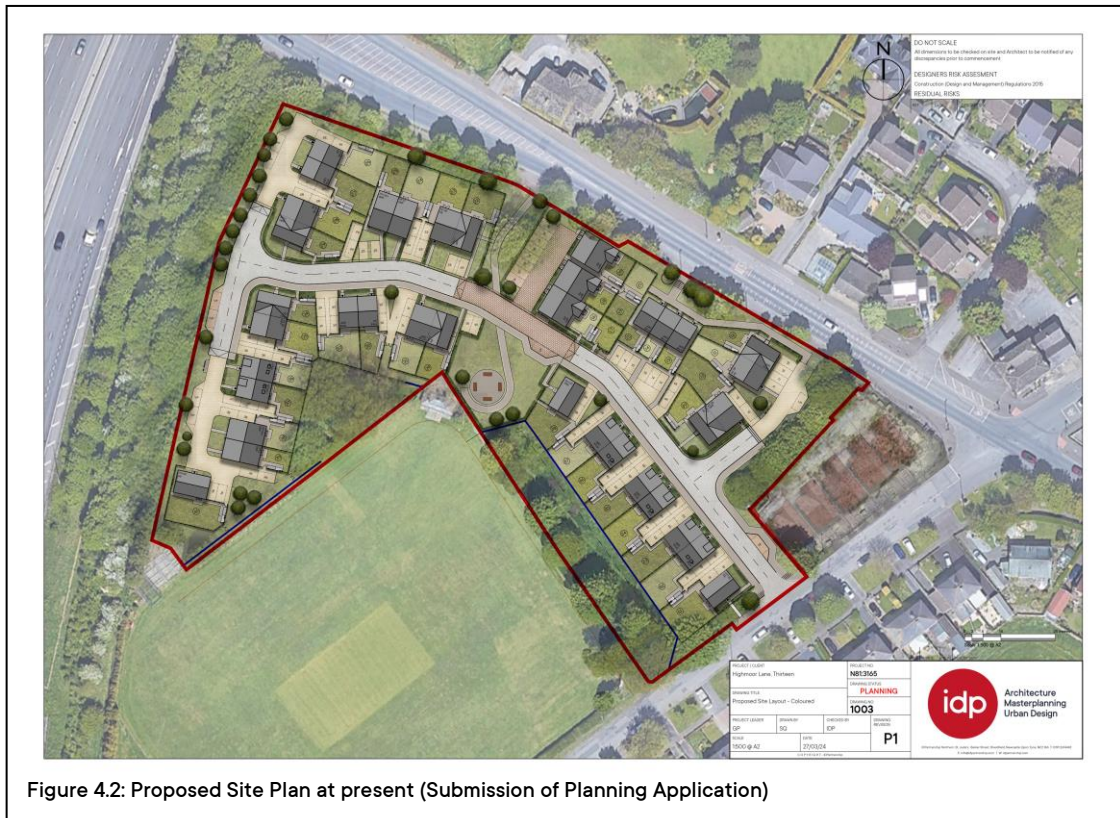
Proposed Site Plan at present (Submission of Planning Application)
